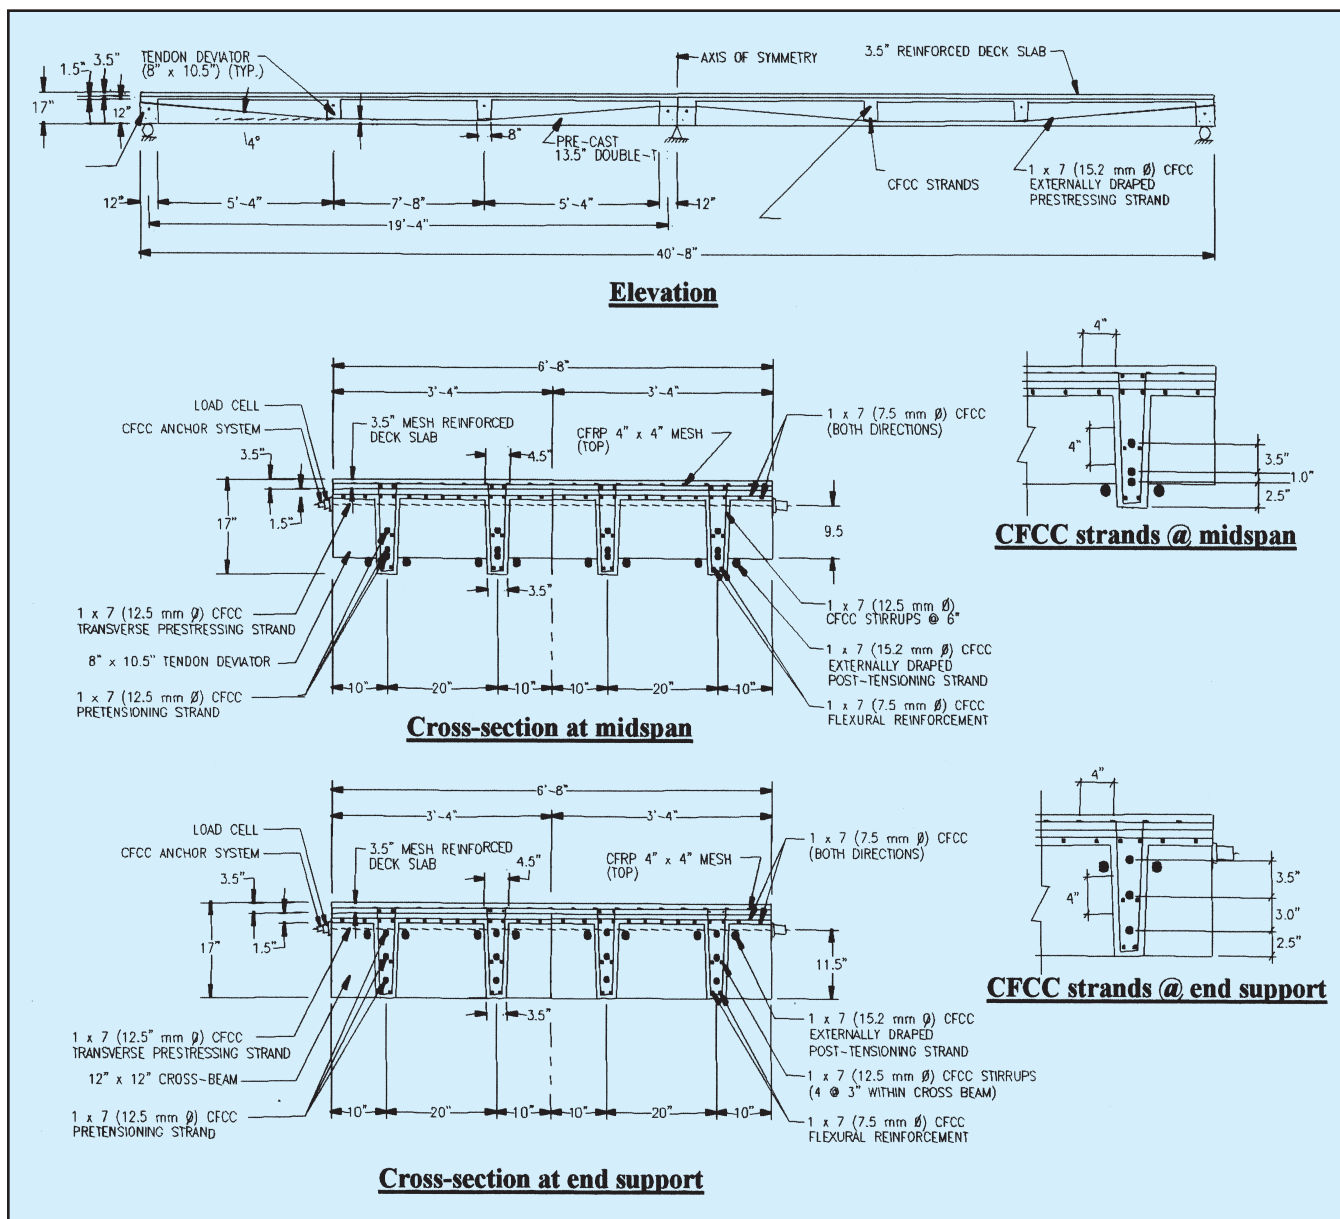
Details of Bridge Model CDT2, prestressed and reinforced using CFCC strands.
